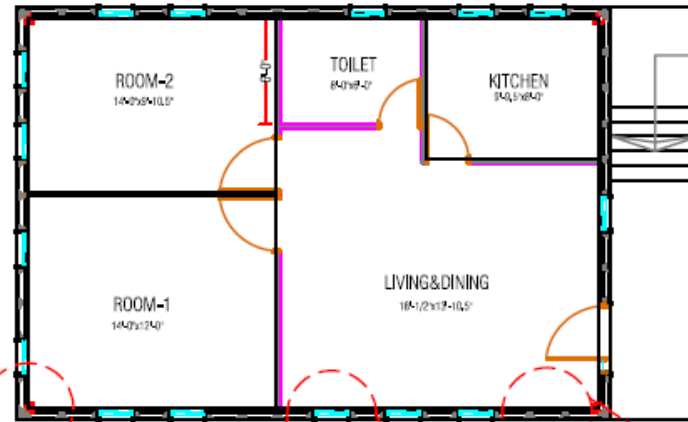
DETAIL PLAN (EXTRUDED CONCRETE BASE PANEL - BYUCKSAN)
